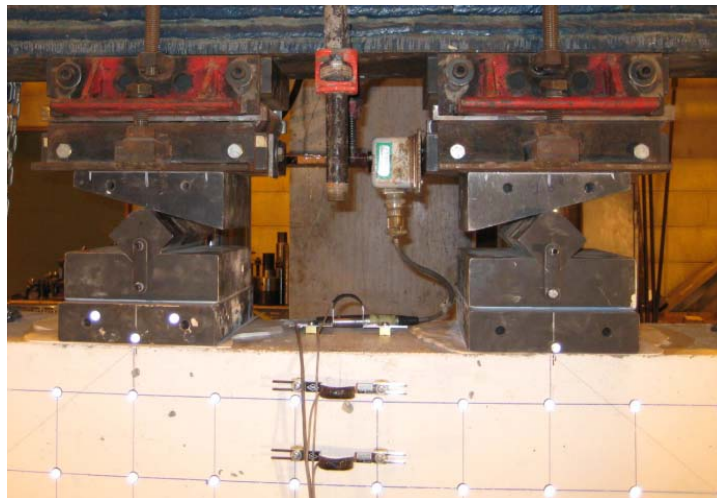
Three PI gauges installed at mid-span of specimen B2N.
